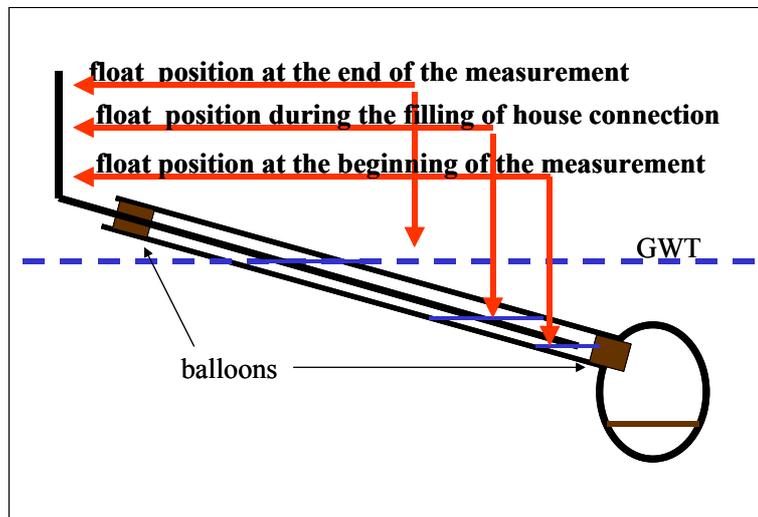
Scheme of installation of the measurement equipment in a house connection connected to passable sewer
